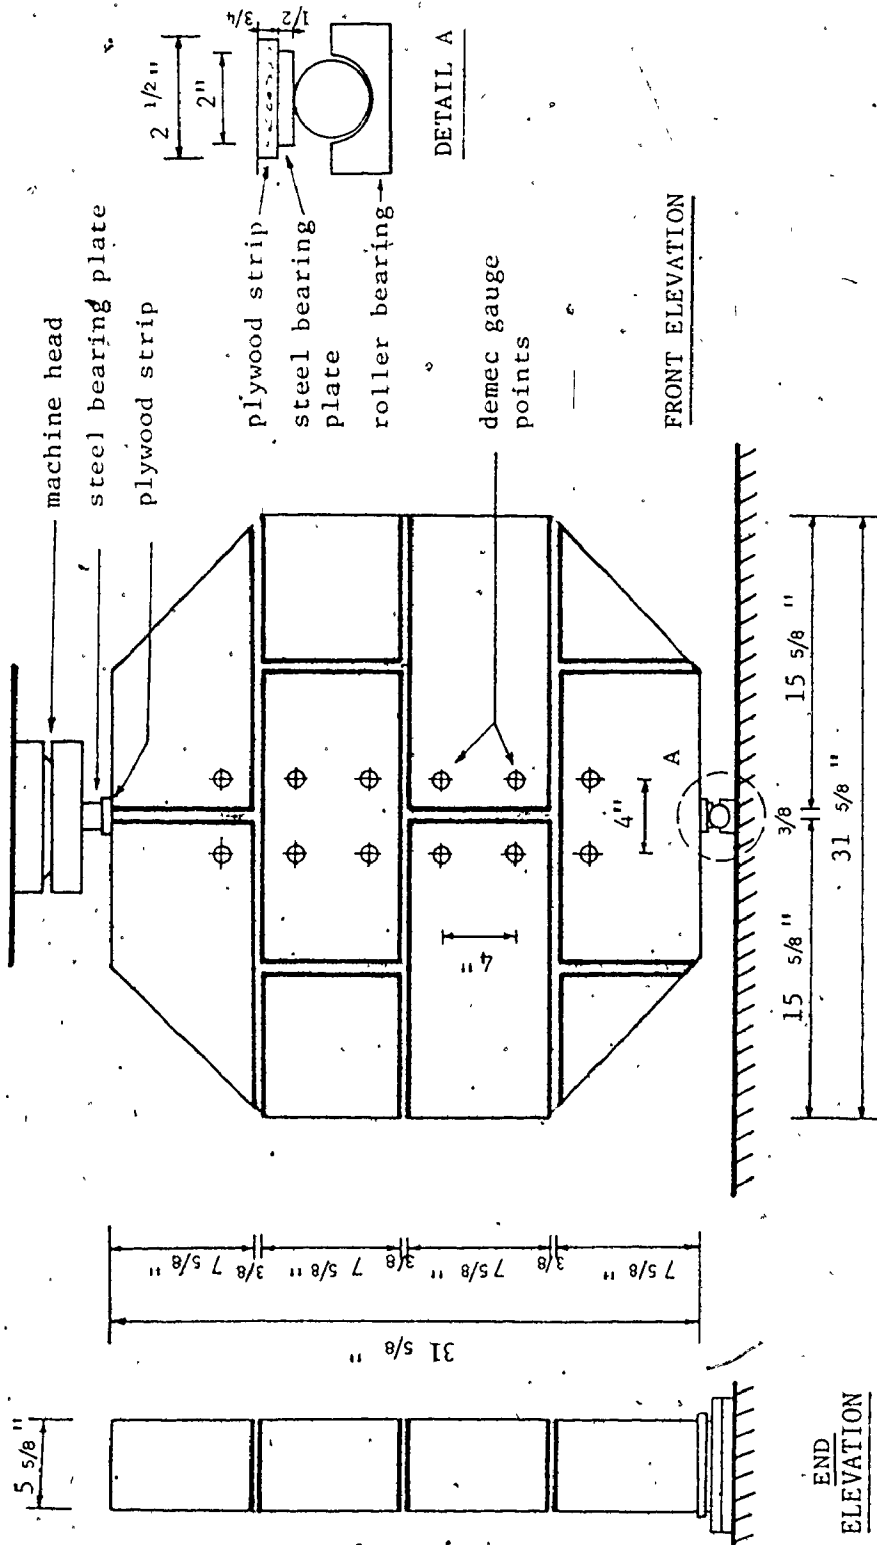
SPLITTING TENSION TEST SET-UP FOR CONCRETE MASONRY DISCS
